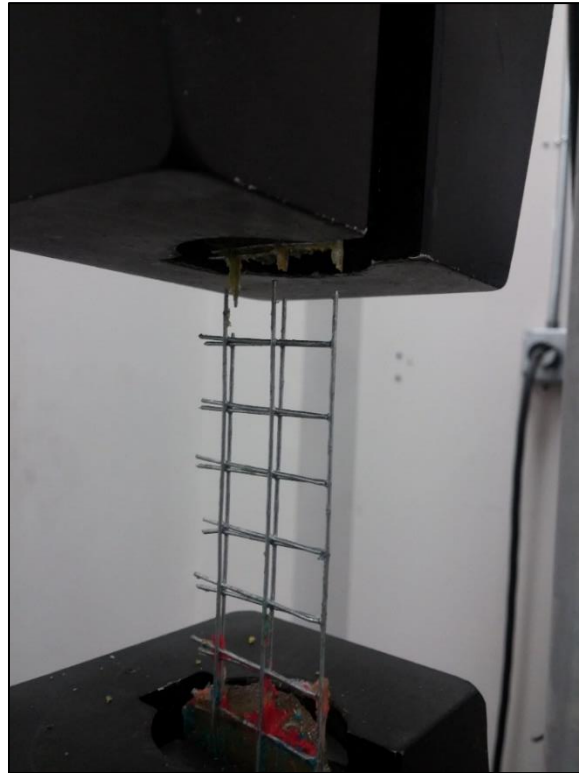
WWSM uniaxial tensile test setup and failed specimen.
